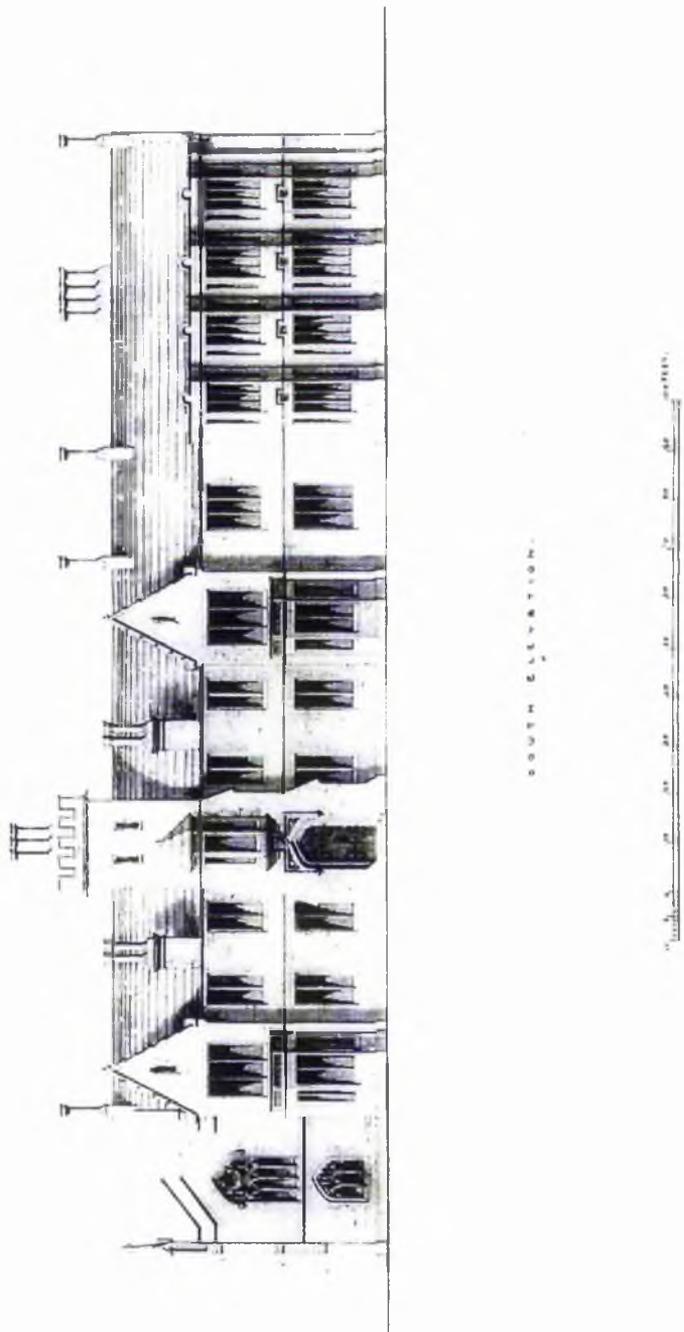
King's College. Oxford gothic south elevation showing new south entrance to college. R. Matheson, September, 1855.
